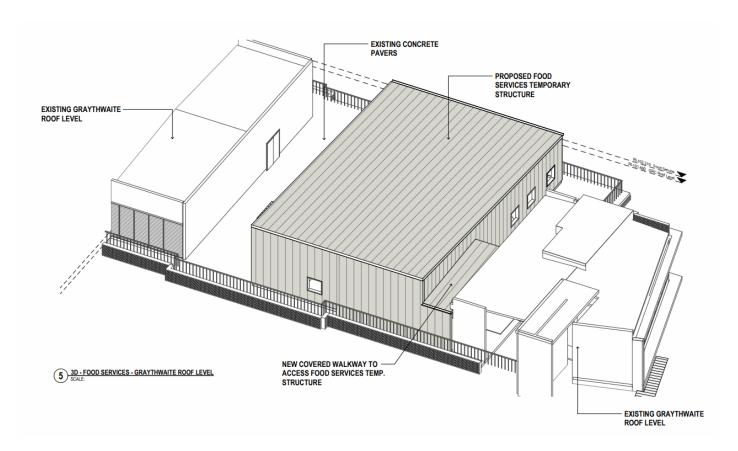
Temporary Food Services Structure on the rooftop of the Graythwaite Building
